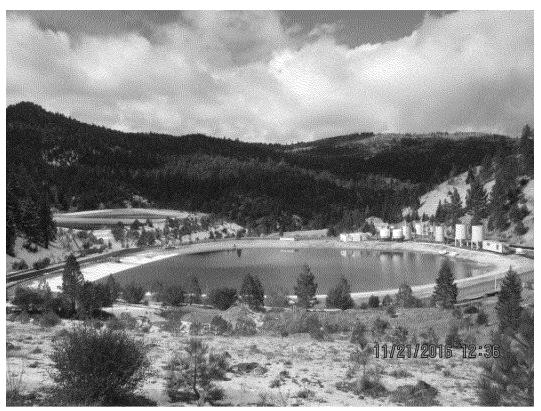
Pond 1 in the foreground and Ponds 2 North and 2 South in the background
